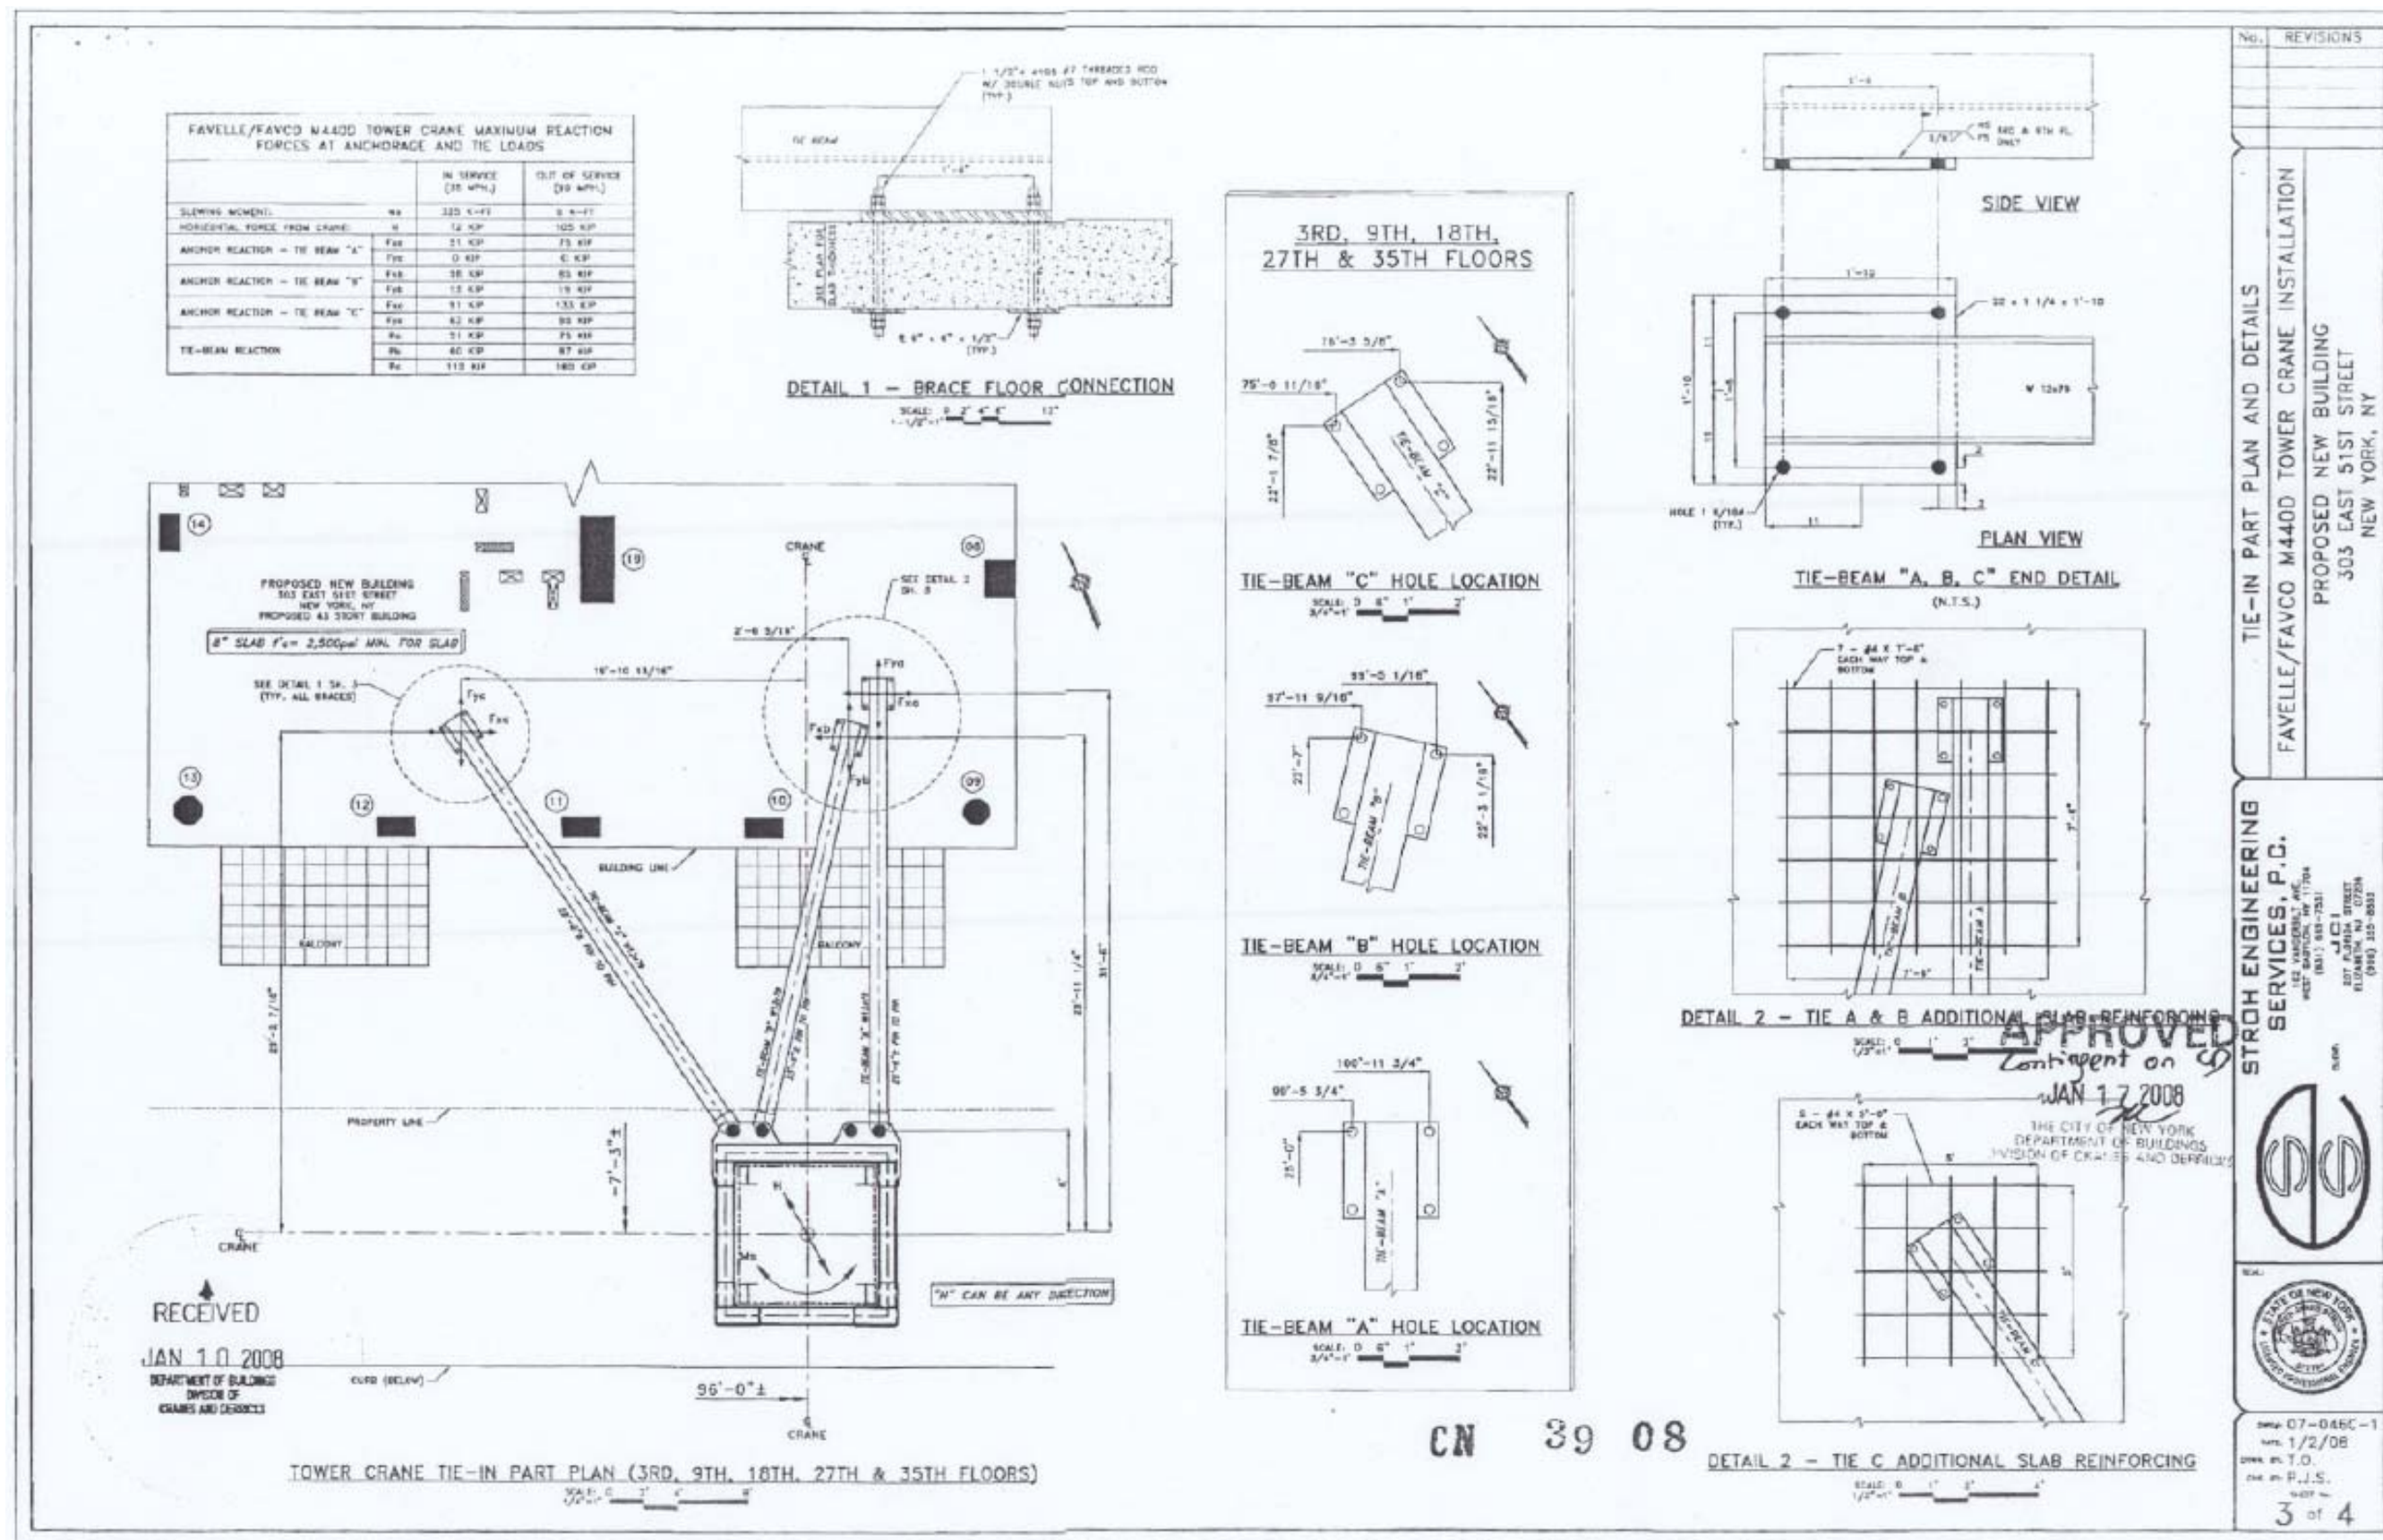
Collar and Tie-Beam Part Plan and Details. Provided by the crane engineer Stroh Engineering, drawing 07-046C-1 sheet 3 of 4 dated 1/2/08.
